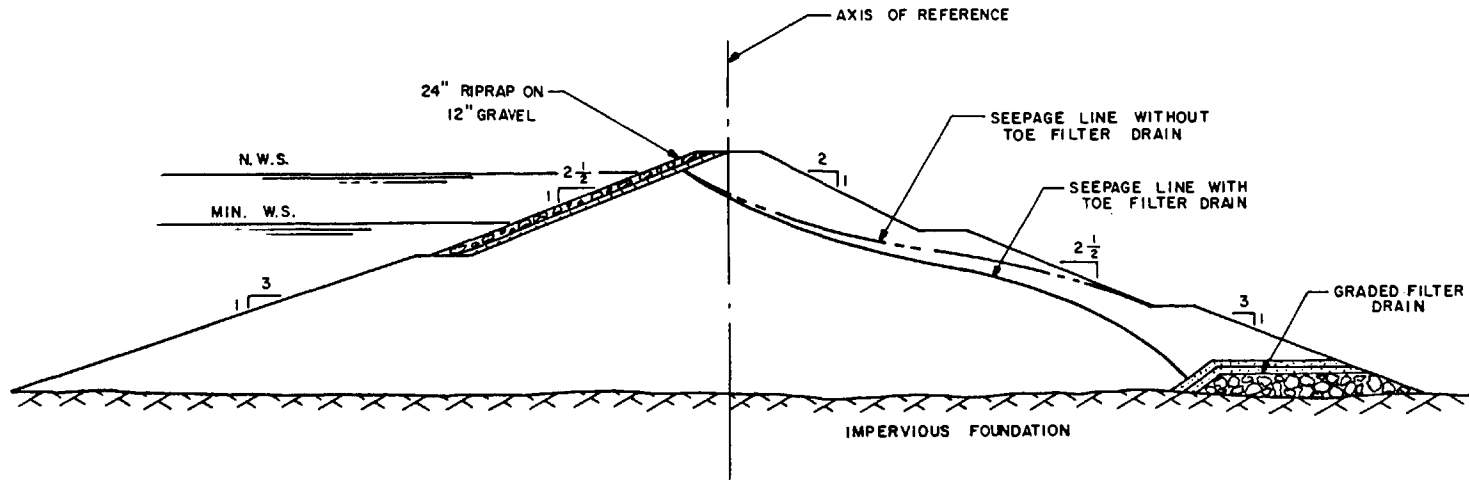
Typical Section of a Rolled Earth-fill Dam Built with Uniform Materials
